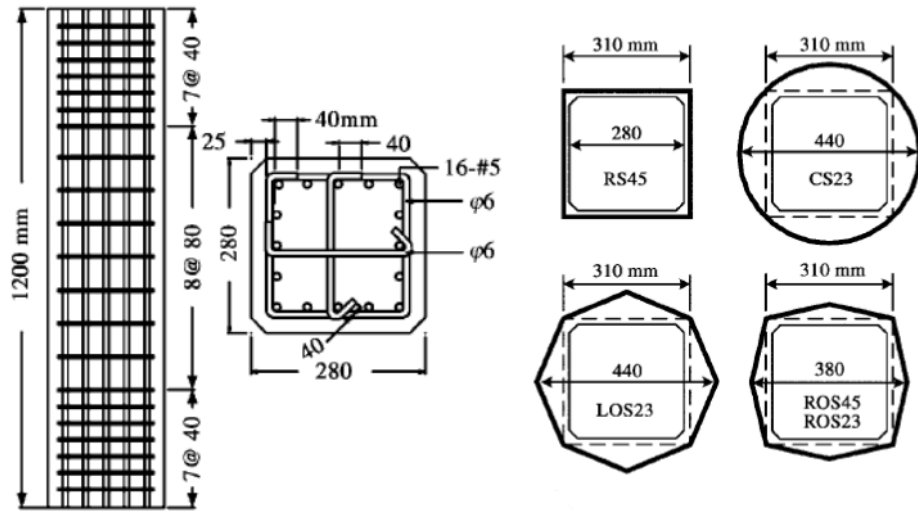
Detail of test specimen and steel jacketing schemes [27]
